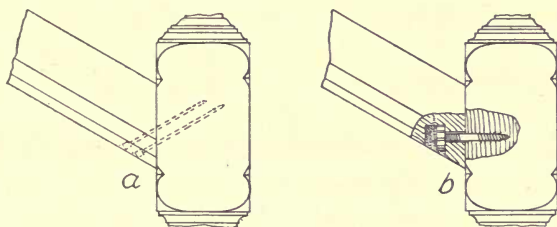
METHODS OF FASTENING HANDRAILS TO POSTS.
